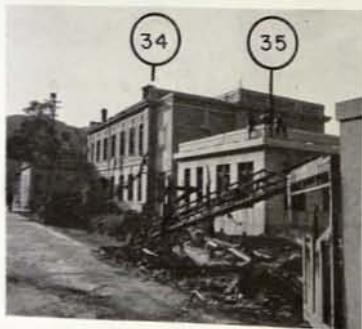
4,800 feet from GZ. Group 26, Buildings 34 and 35. Looking northwest.
